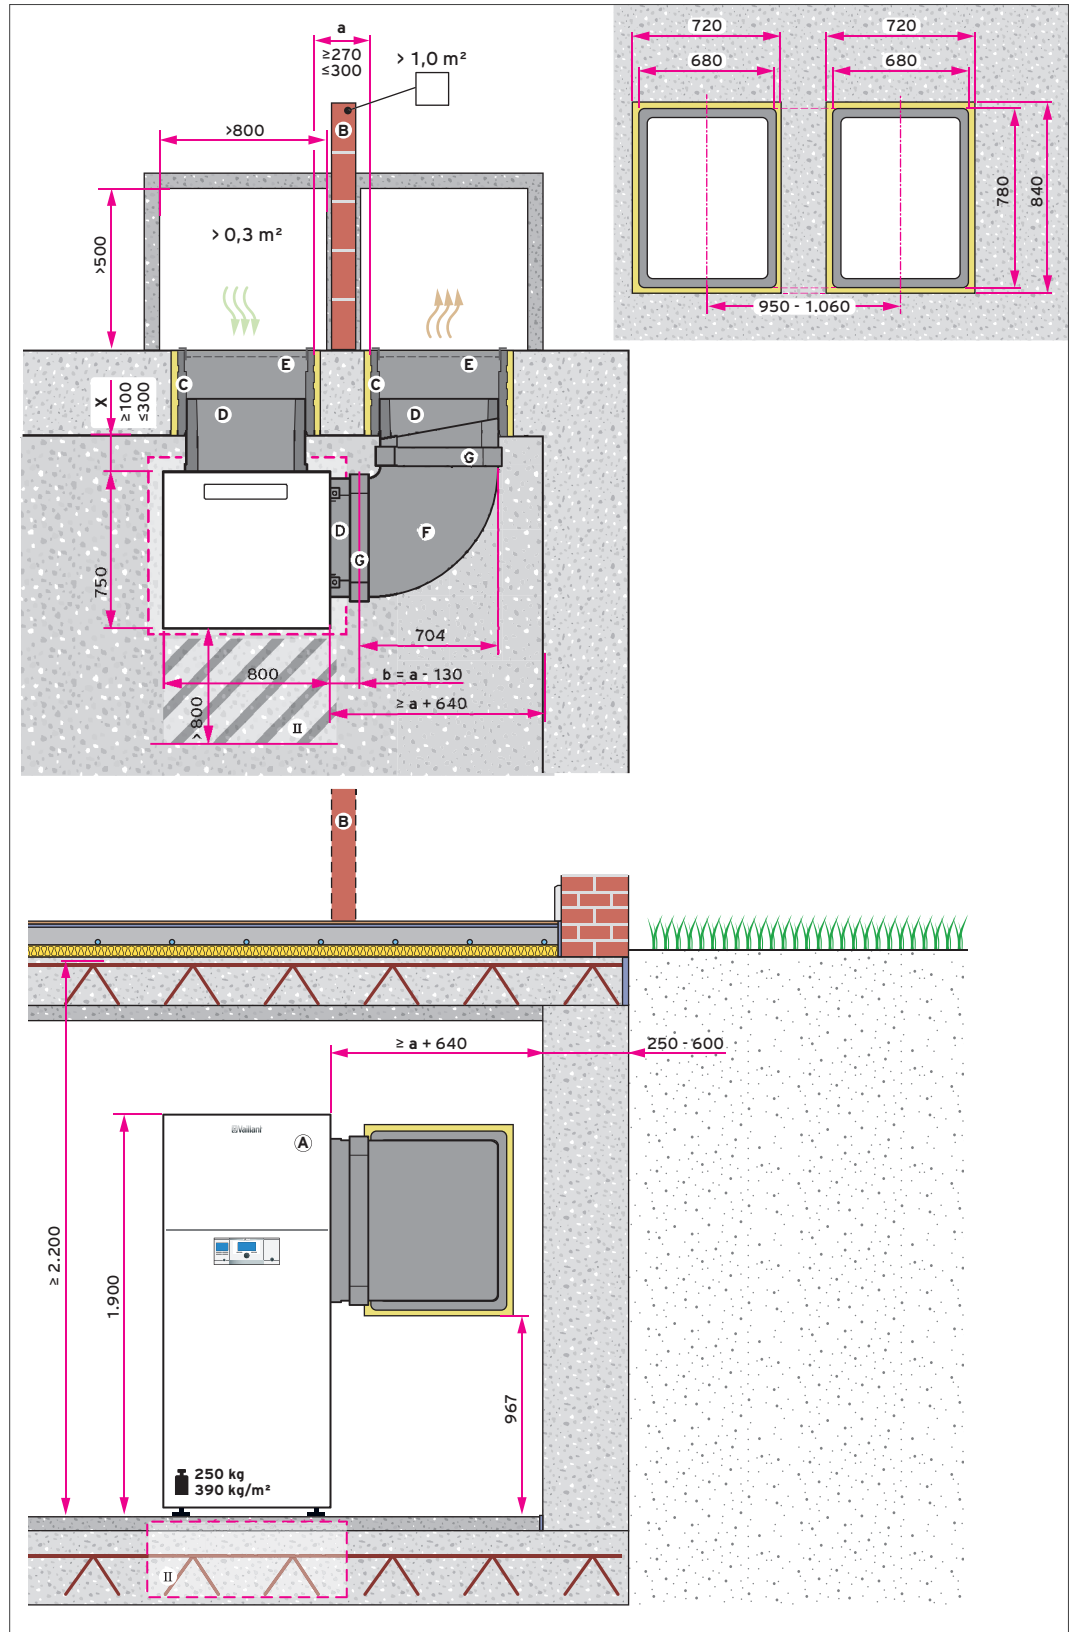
versoTHERM installation situation, cellar - single-wall installation
